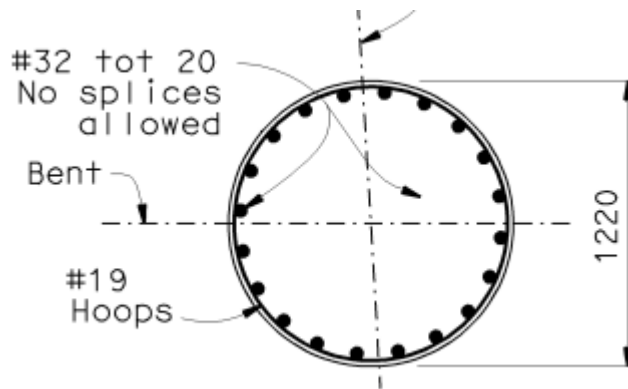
Cross-section detail of Adobe bridge column (Caltrans)
